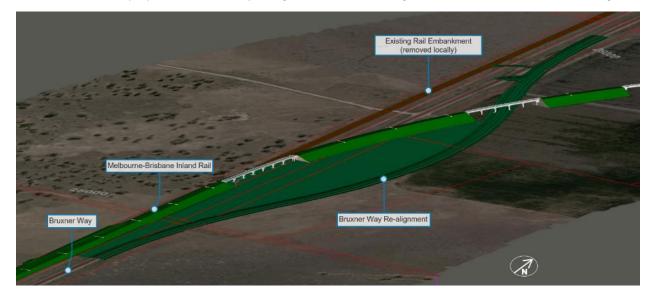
AERIAL VIEW OF THE PROPOSED BRUXNER WAY REALIGNMENT
